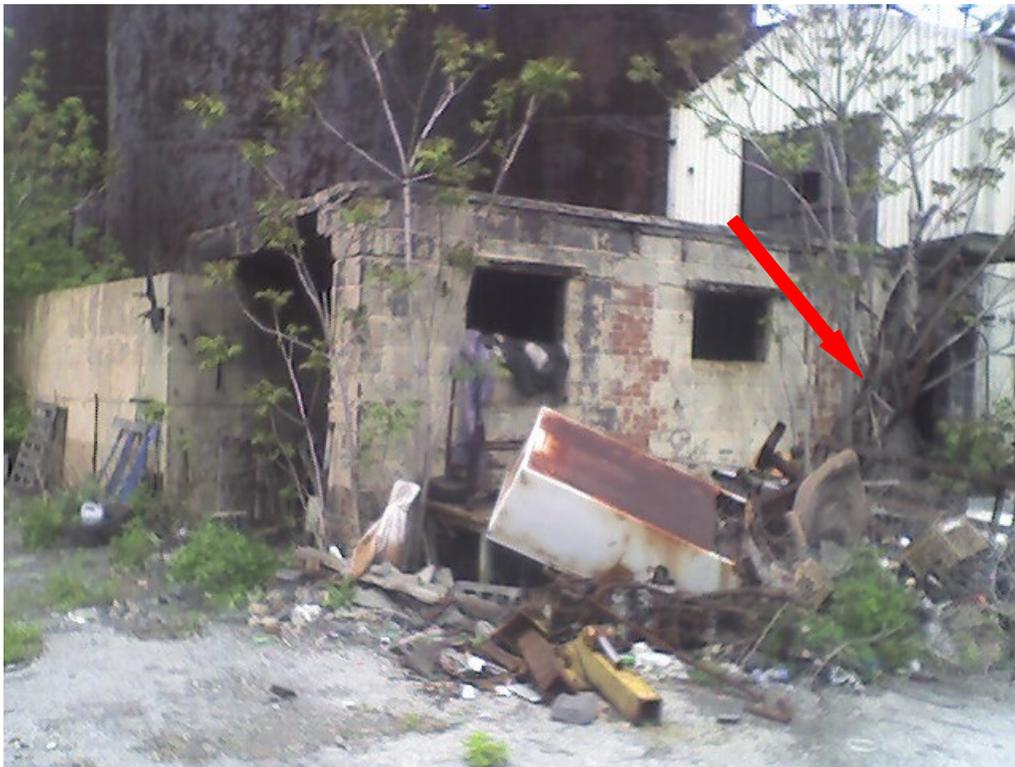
Damaged Exterior Metal Stair of One-Story Building
